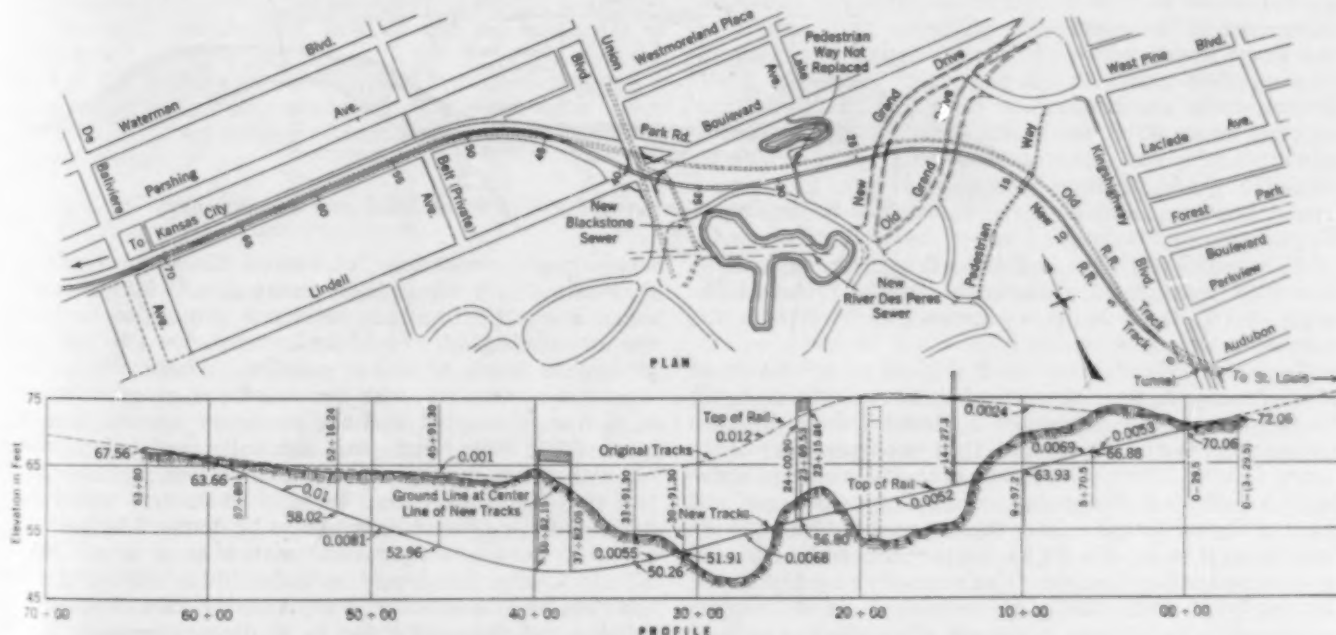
PLAN AND PROFILE OF RAILROAD GRADE SEPARATION AT UNION AND LINDELL BOULEVARDS
